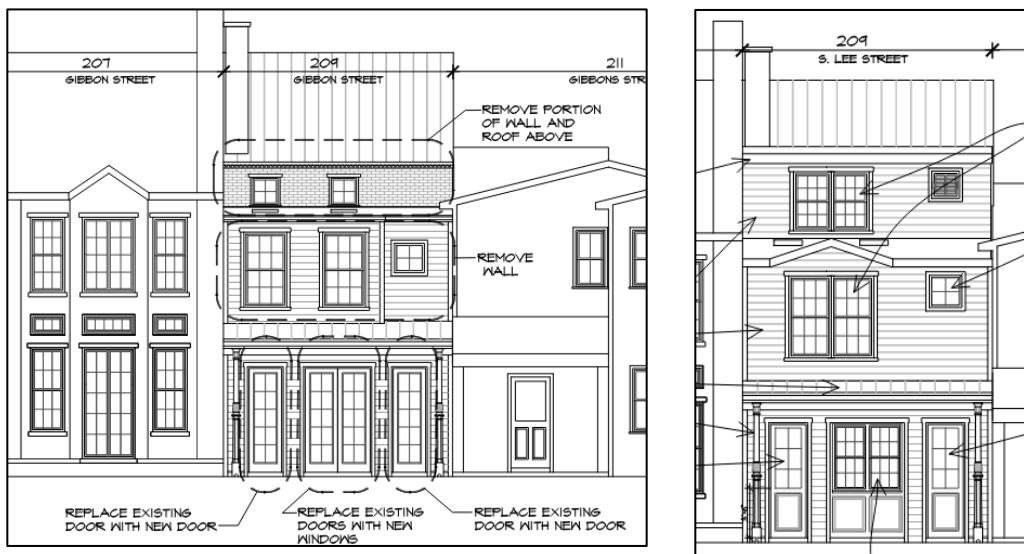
Proposed demolition work (left) and new construction (right) on north/rear elevation
